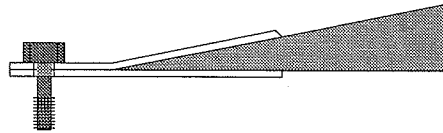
Sketched principle of proposal for wall-mount steel frame. Vertical cross section.
